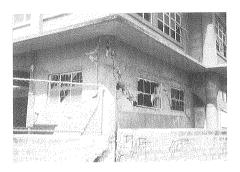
Severe shear cracking of first storey wall in St. Louis University (Girls' Campus)
